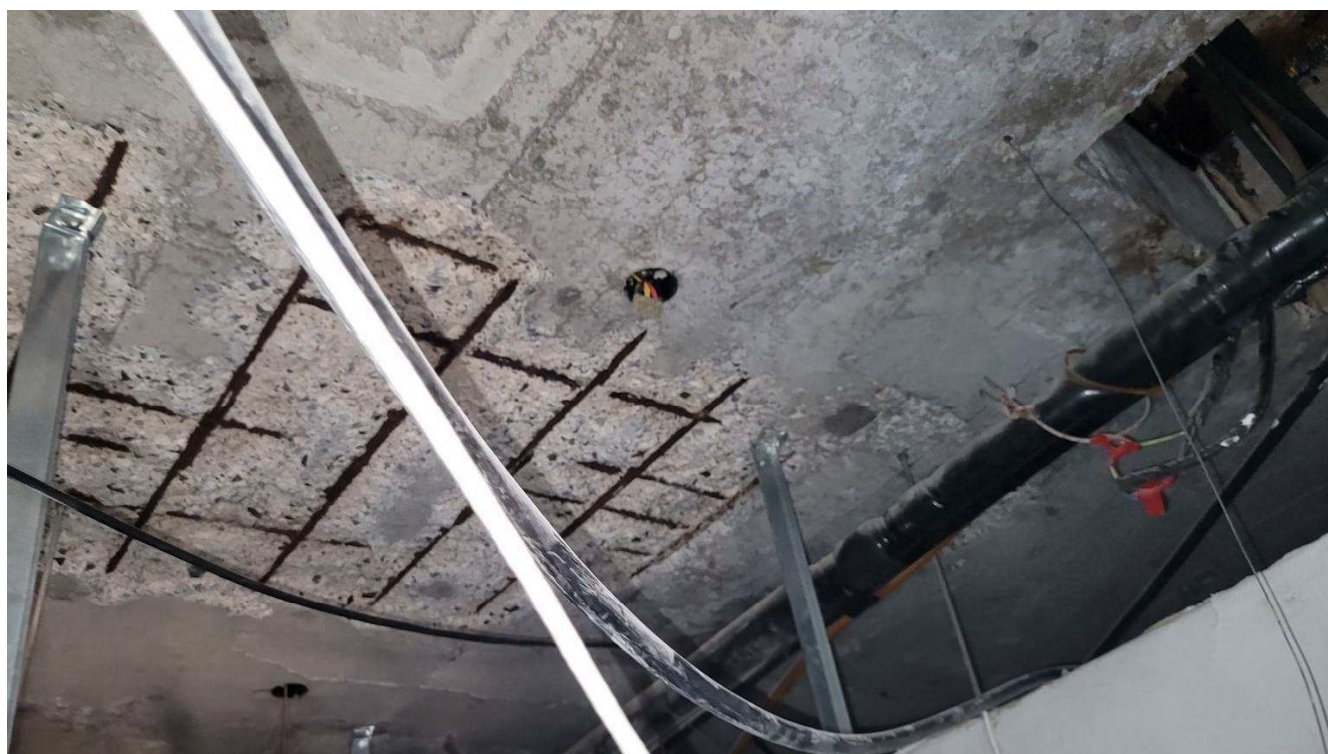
Steel reinforcements exposure with corrosion in slab soffit
